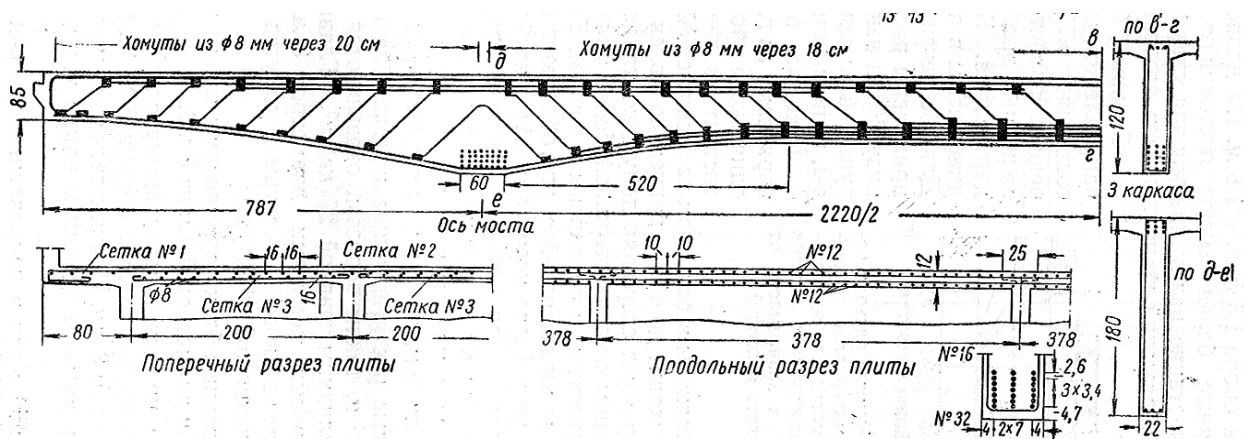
The longitudinal- and cross-section of reinforced concrete bridge; [5], p. 127
